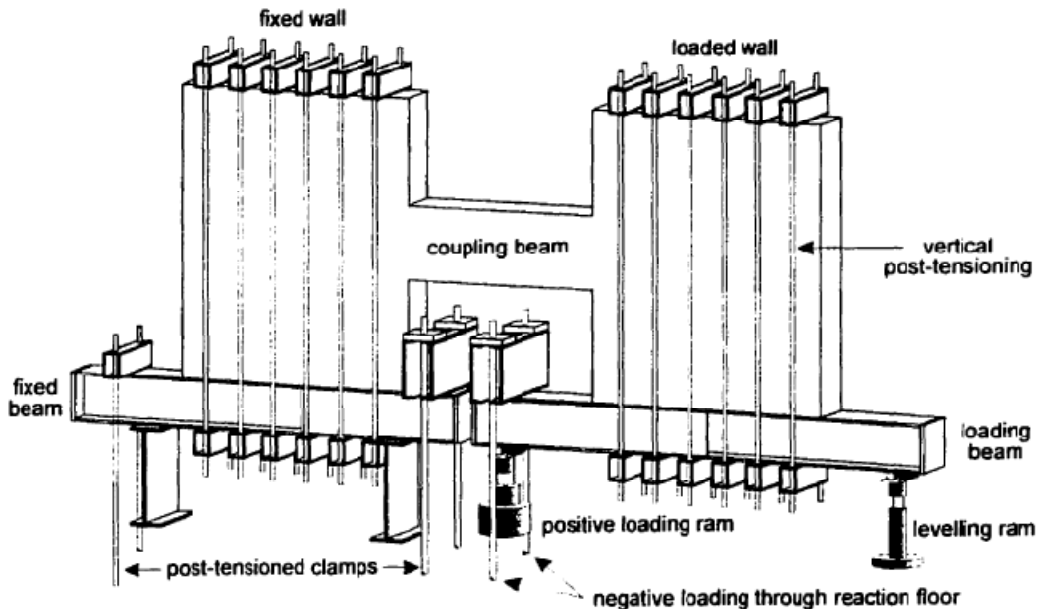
Test Setup of Specimen NR 4 (Bristowe 2000)
